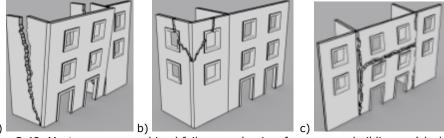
Most common combined failure mechanism for masonry buildings: a) lack of connection between façade and transversal walls; b) corner failure because of flexible horizontal elements; c) failure because of anchors [191]
